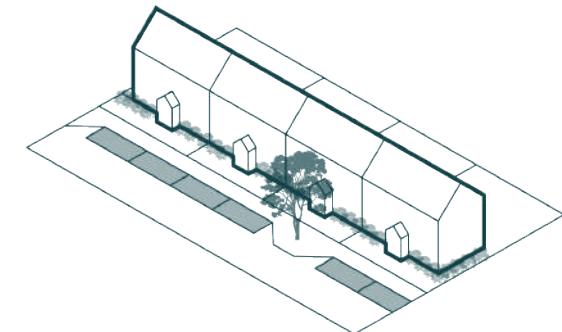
Illustrative diagram showing an indicative layout of on-street parking
